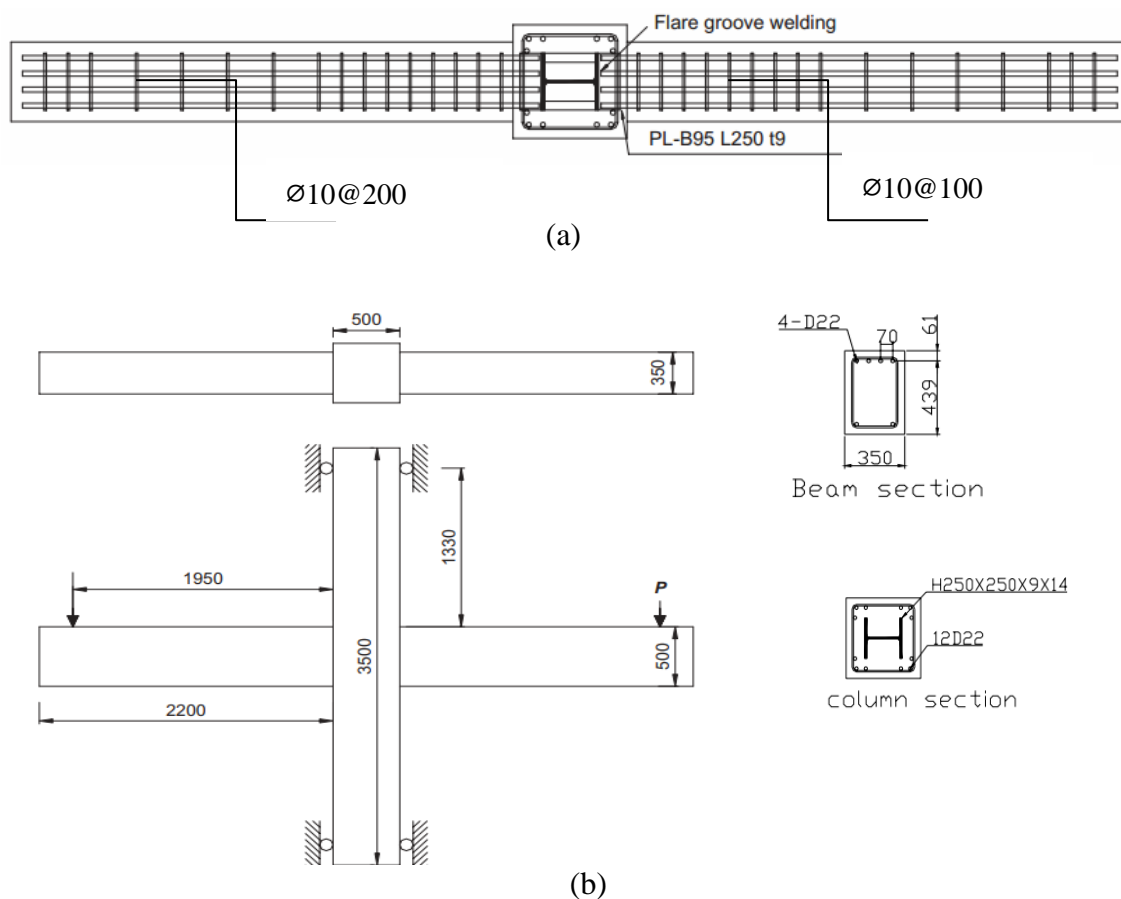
Detail of the specimen tested by Young-Kyu Ju (2005) (a) plan of passing through type;(b) dimensions of the specimen (units: mm)(Ju & Chun, 2005)
